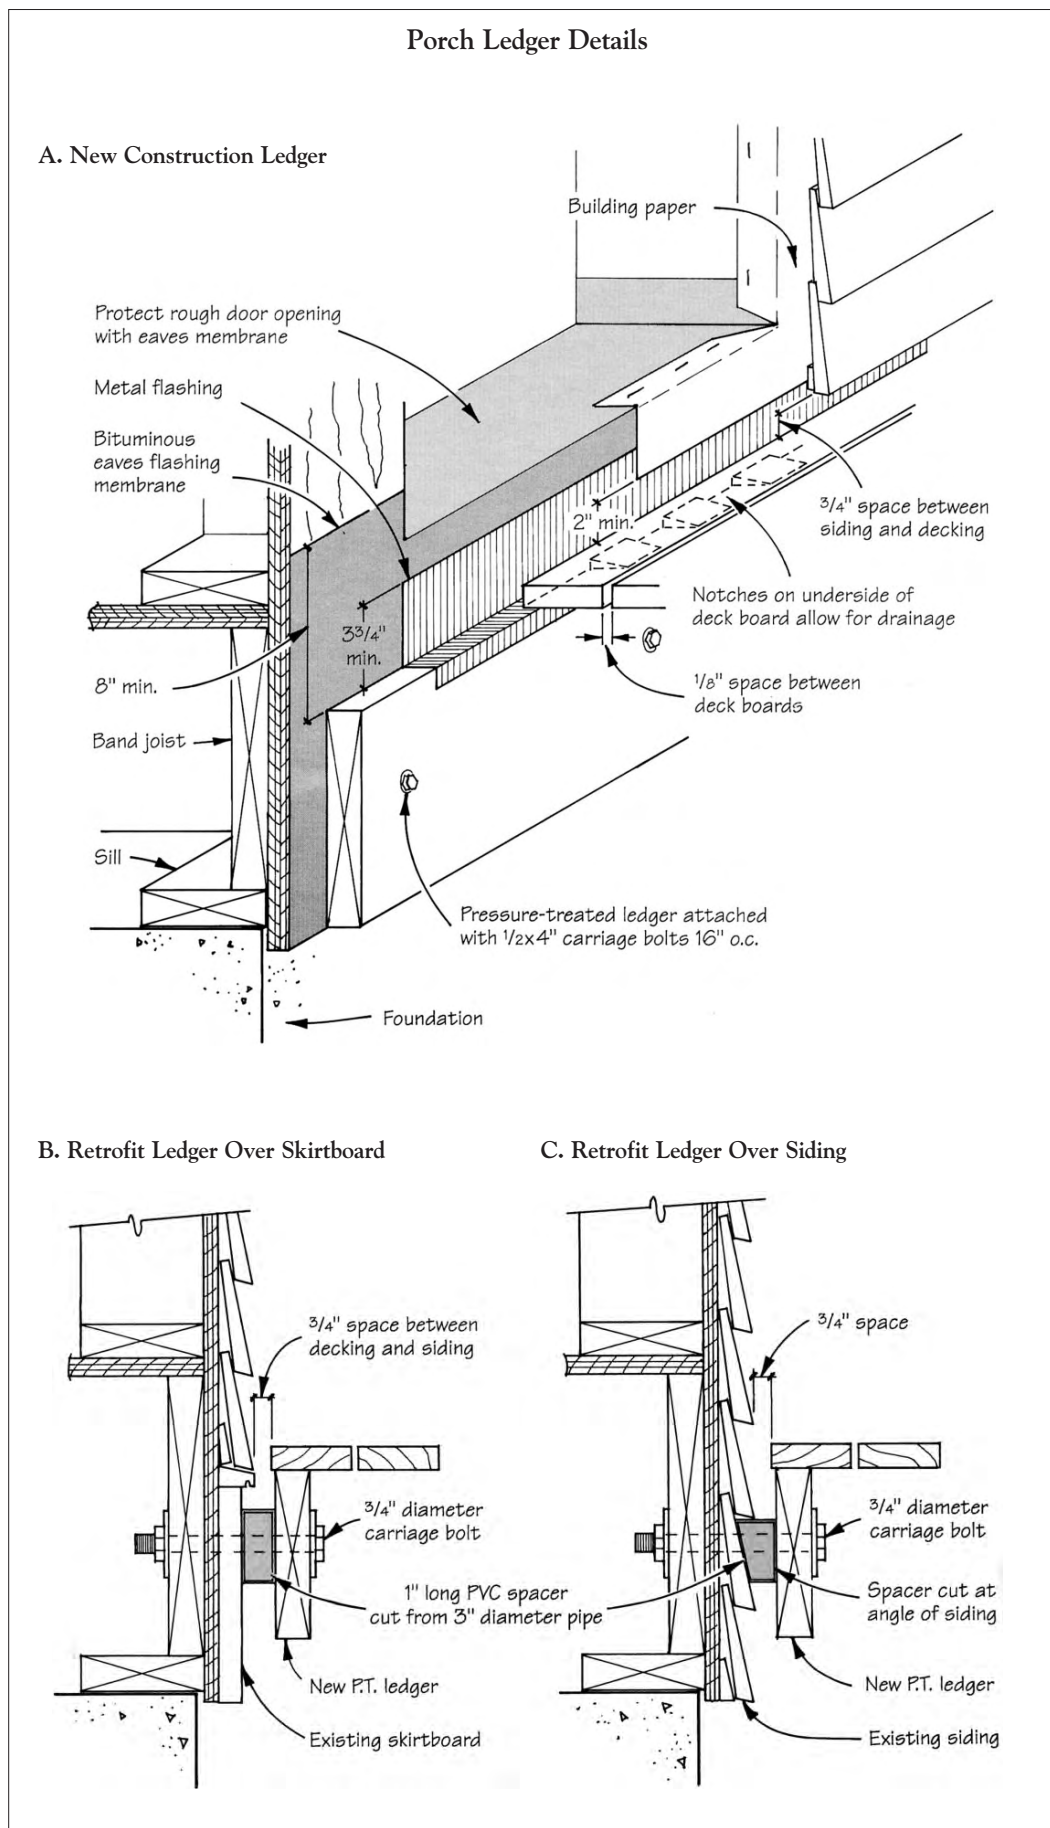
When adding a porch to new construction (A), the author first installs a protective layer of bituminous eaves flashing over the sheathing. He then attaches the porch ledger several inches below interior floor level, bolting it through the band joist. Site-bent metal flashing, slipped behind the building paper above, covers the top of the ledger. For retrofit ledgers, the author uses PVC spacers to create a drainage gap behind the ledger. When installing the spacers over a finish skirt board (B), he cuts them square at both ends; over siding (C), he angles one end of the spacer.
